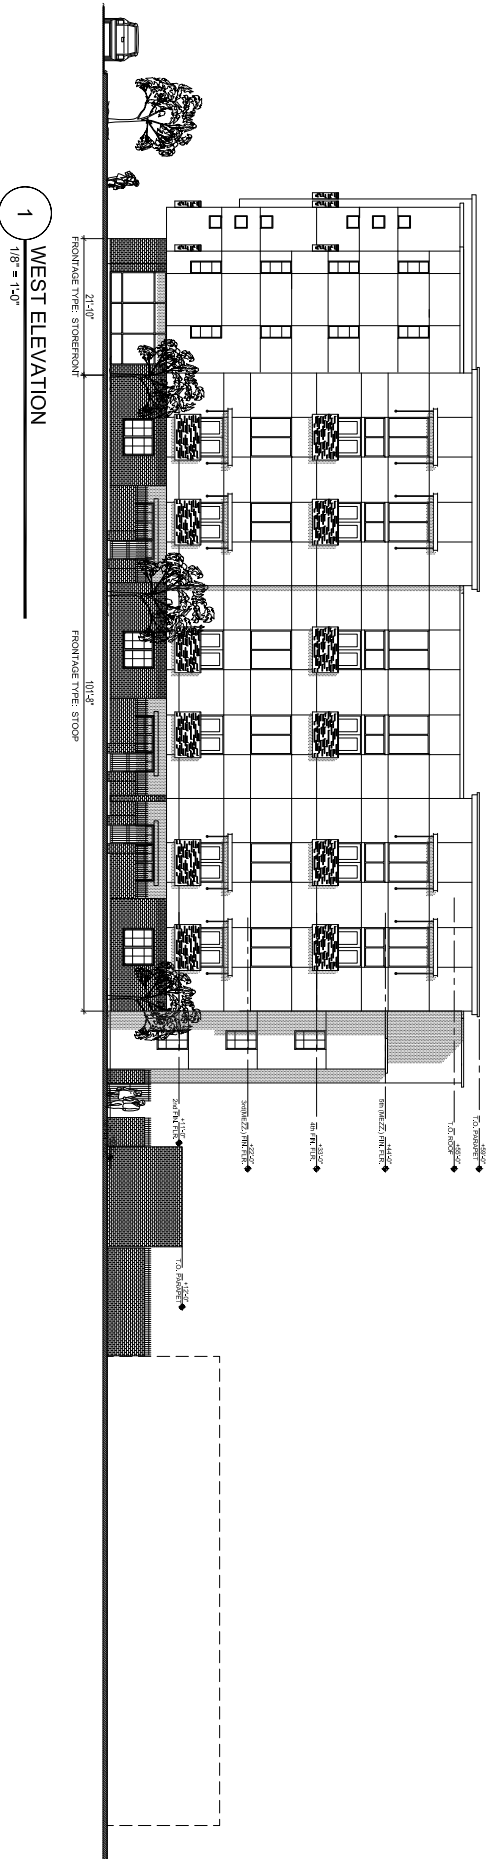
EXHIBIT I: CONCEPTUAL BUILDING ELEVATIONS
